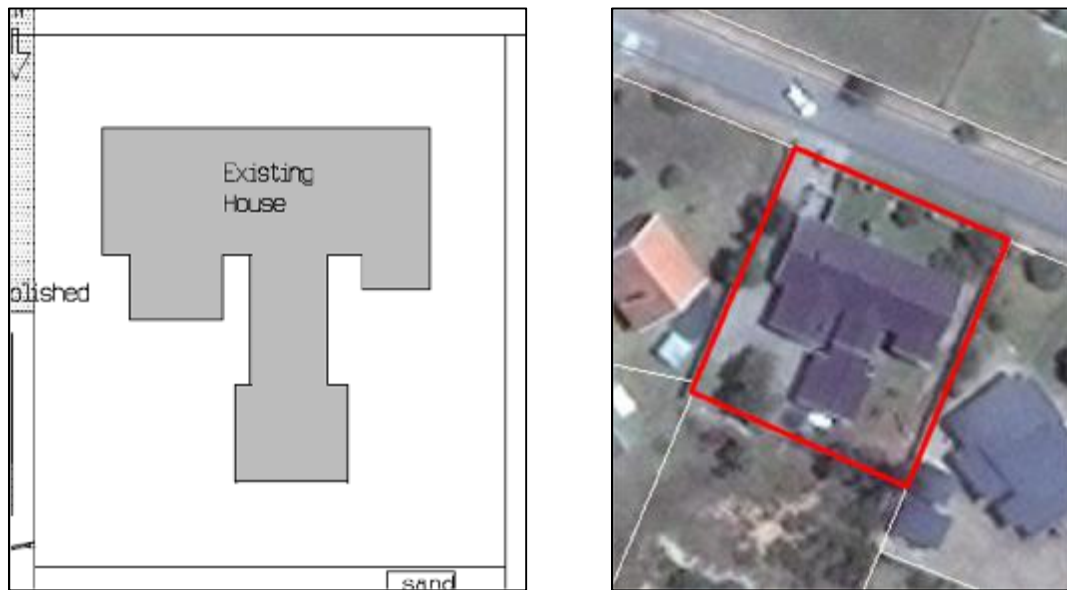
EXISTING STRUCTURE ON ERF 20602
